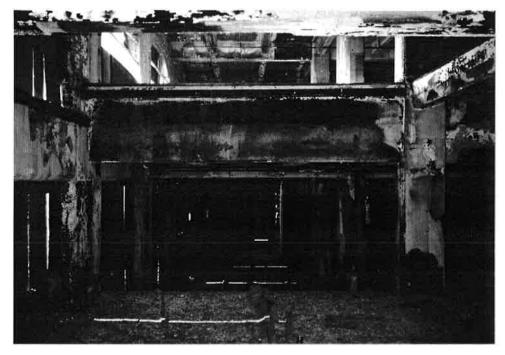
and 28: North parapet and mechanical shaft; northwest parapet corner of roof, 1998.
